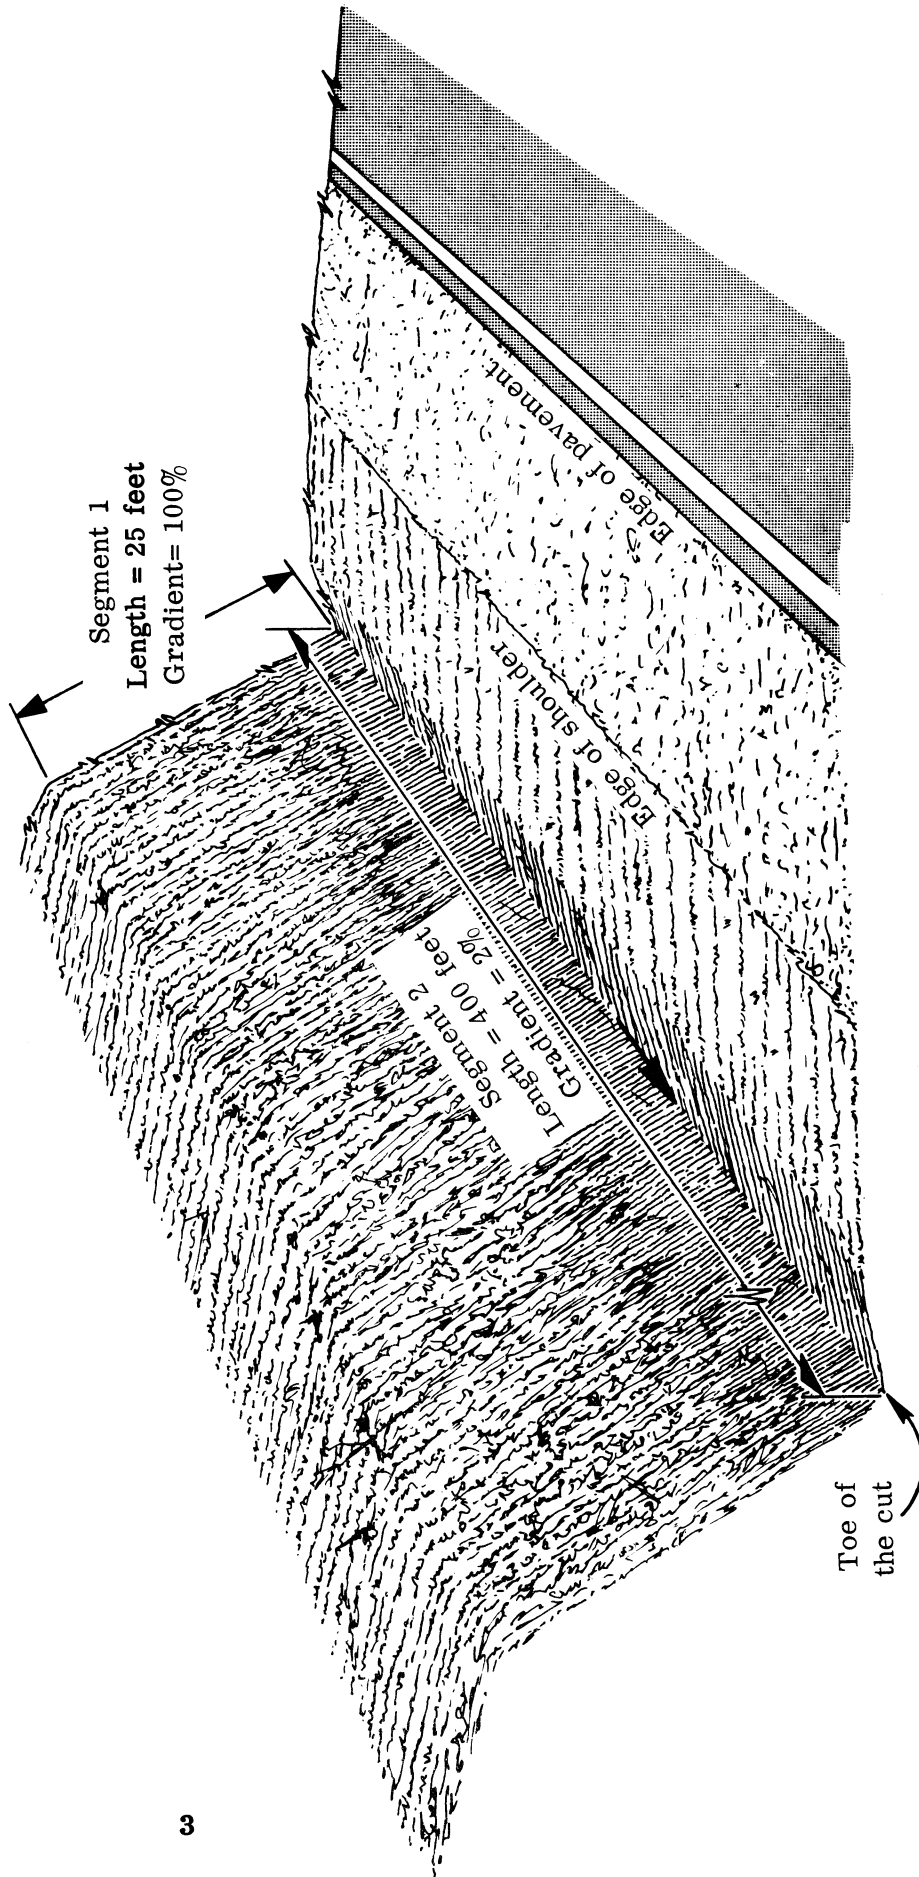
Typical highway slope divided into segments. (Segments are not necessarily to scale.)
